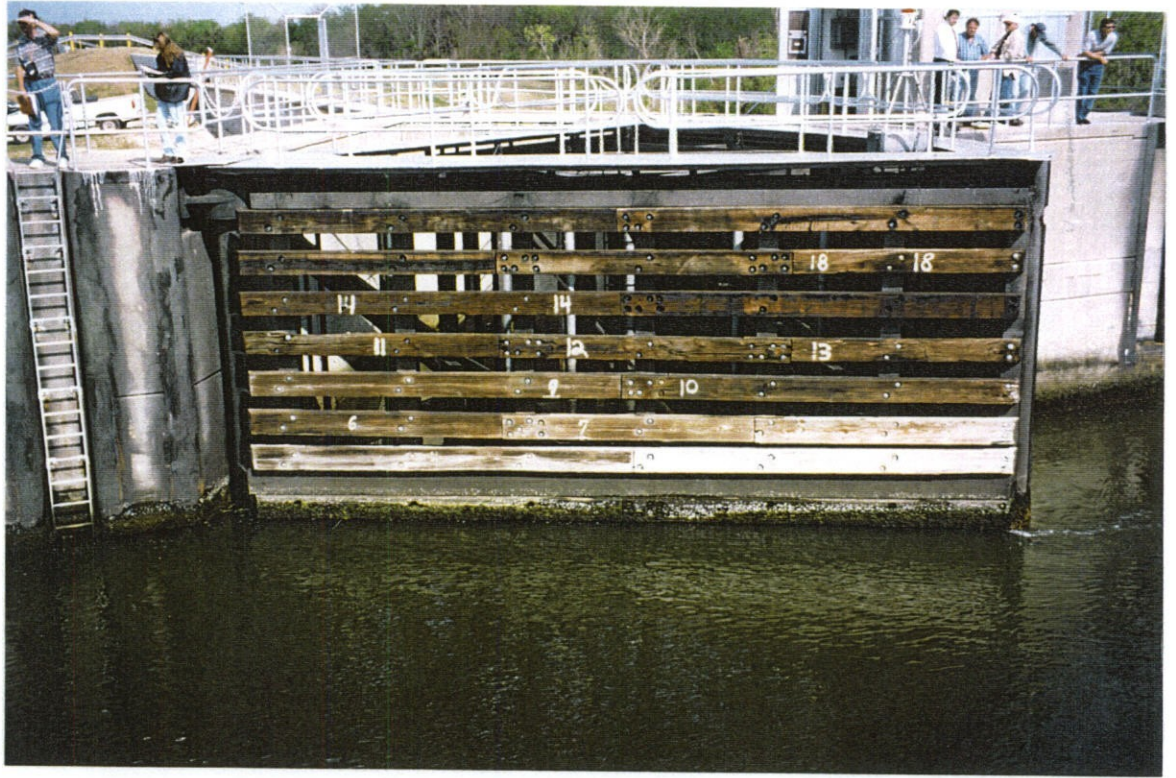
TIMBER FENDER SYSTEM ON WEST GATE SECTOR.
